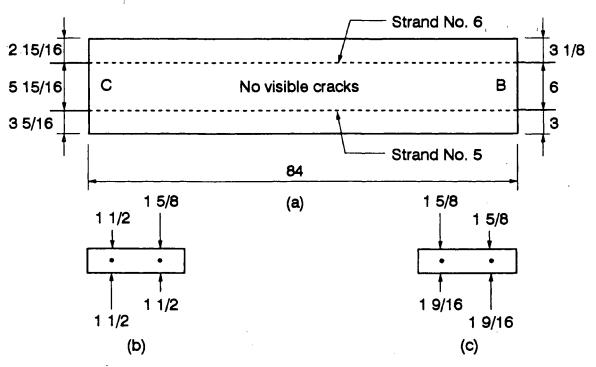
Specimen No. 4-3.0TC-6 (dimensions shown in inches):
